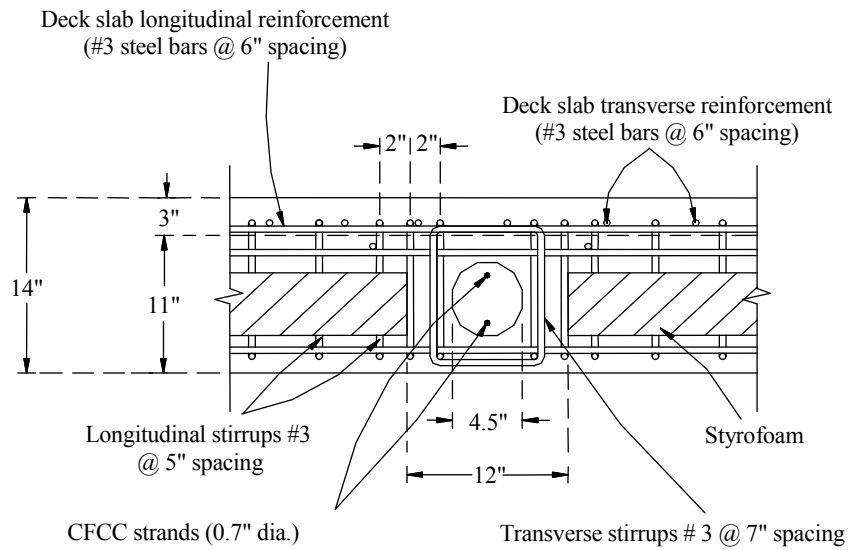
Cross-sectional details of intermediate diaphragm.
